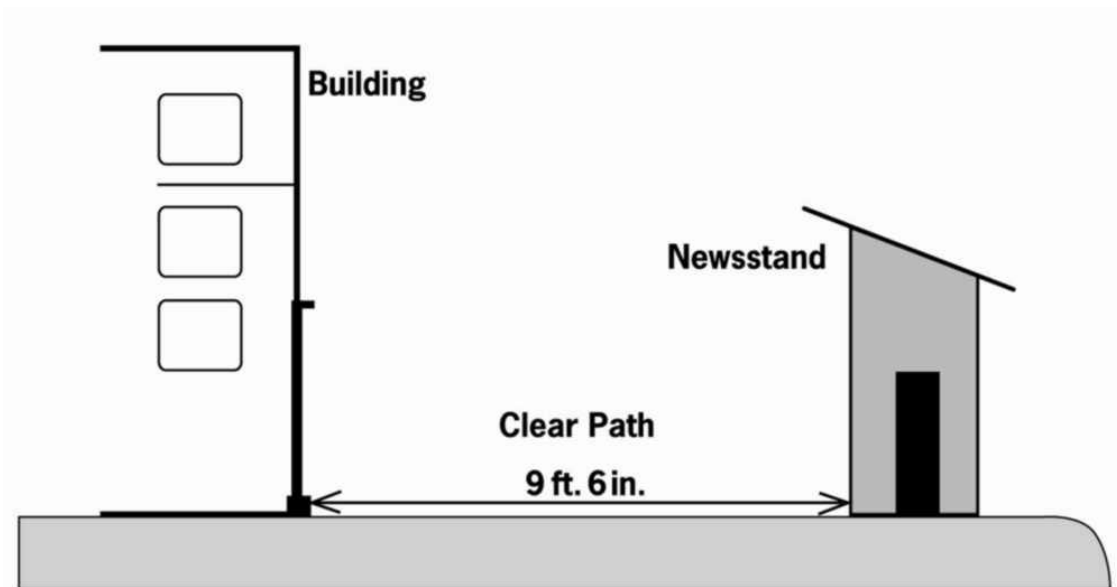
Typical full block front plan showing clear path for property – line newsstand.
